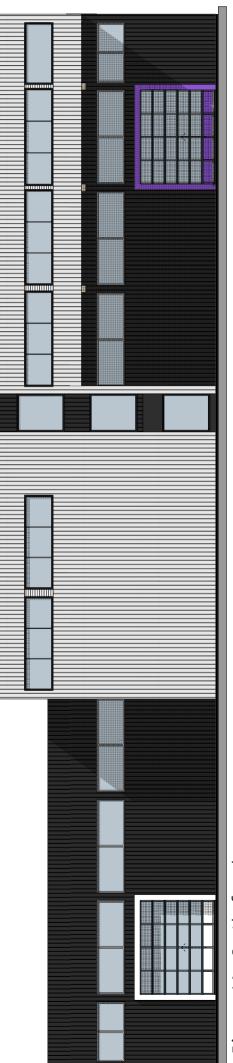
North fasade 1:200 ELEVATIONS 1:200
